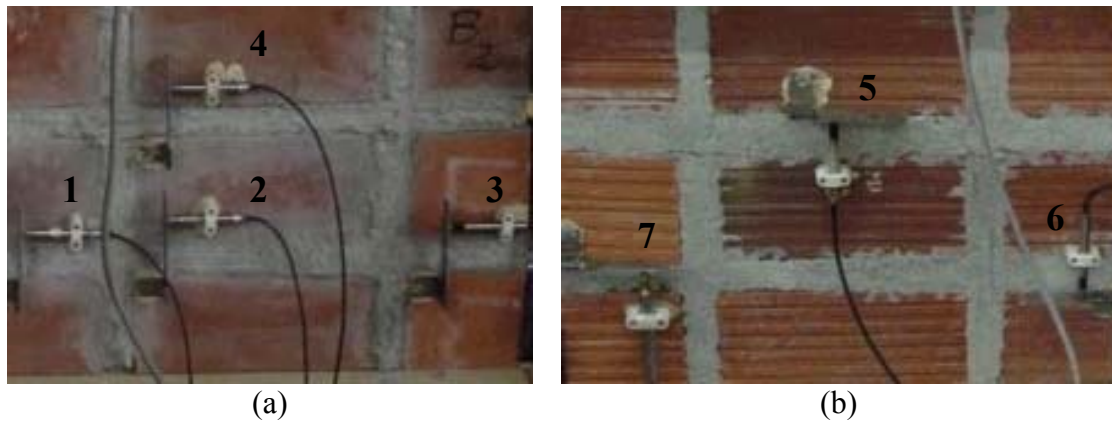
Panel ready for testing with LVDTs installed : (a) front view, with horizontal LVDTs no. 1 – 4 and (b) back view, with vertical LVDTs no. 5 – 7.
